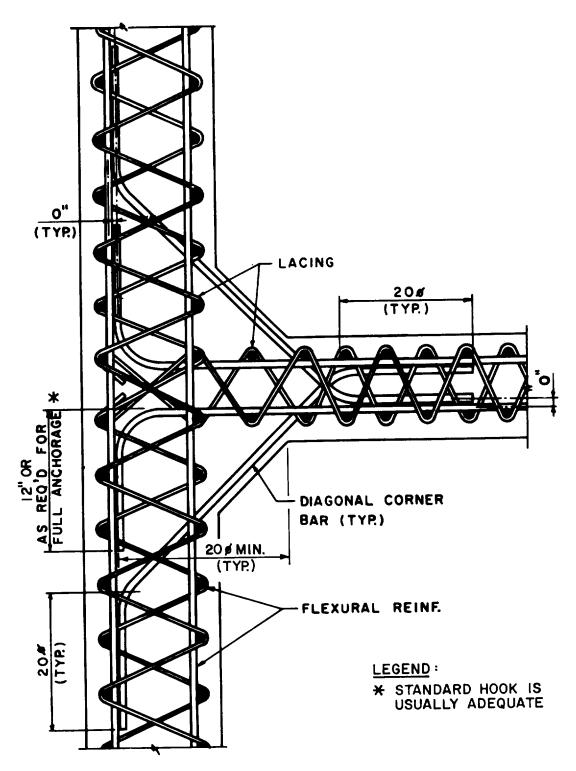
Intersection of continuous and discontinuous laced walls without wall extensions
